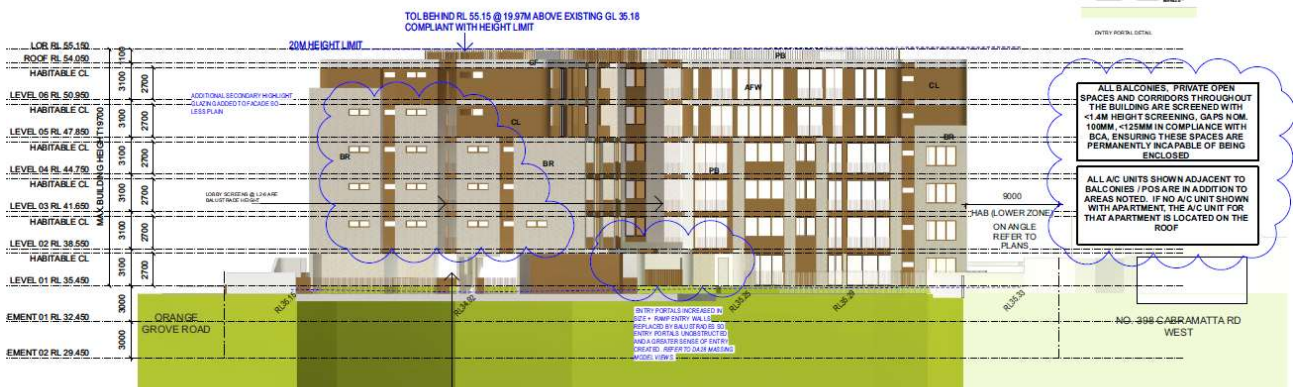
Proposed North Elevation facing Orange Grove Road/Cumberland Highway.
